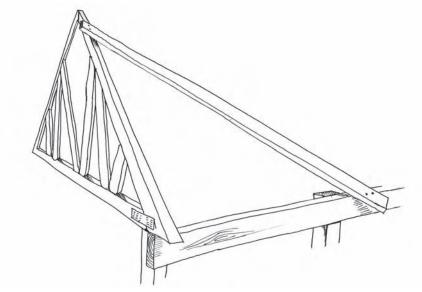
Initial securing of the first truss installed, using a temporary angle brace
